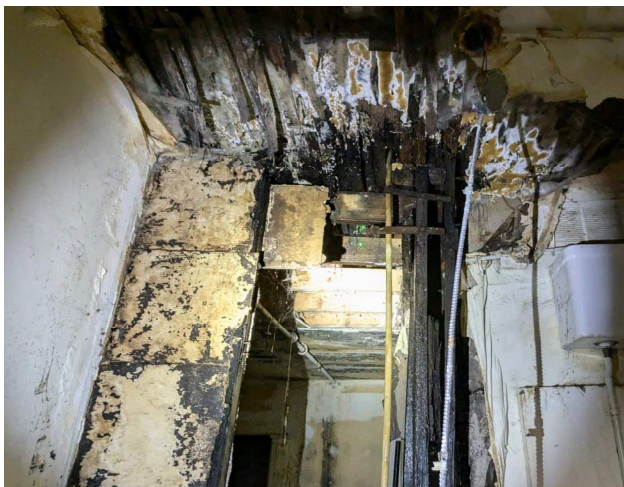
, Structural collapse of floor and failed supporting wall due to rot at 3rd floor.
